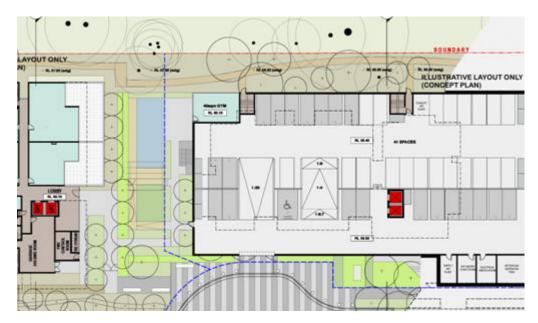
Indicative Lower Ground Floor from Concept Plan MOD 1
